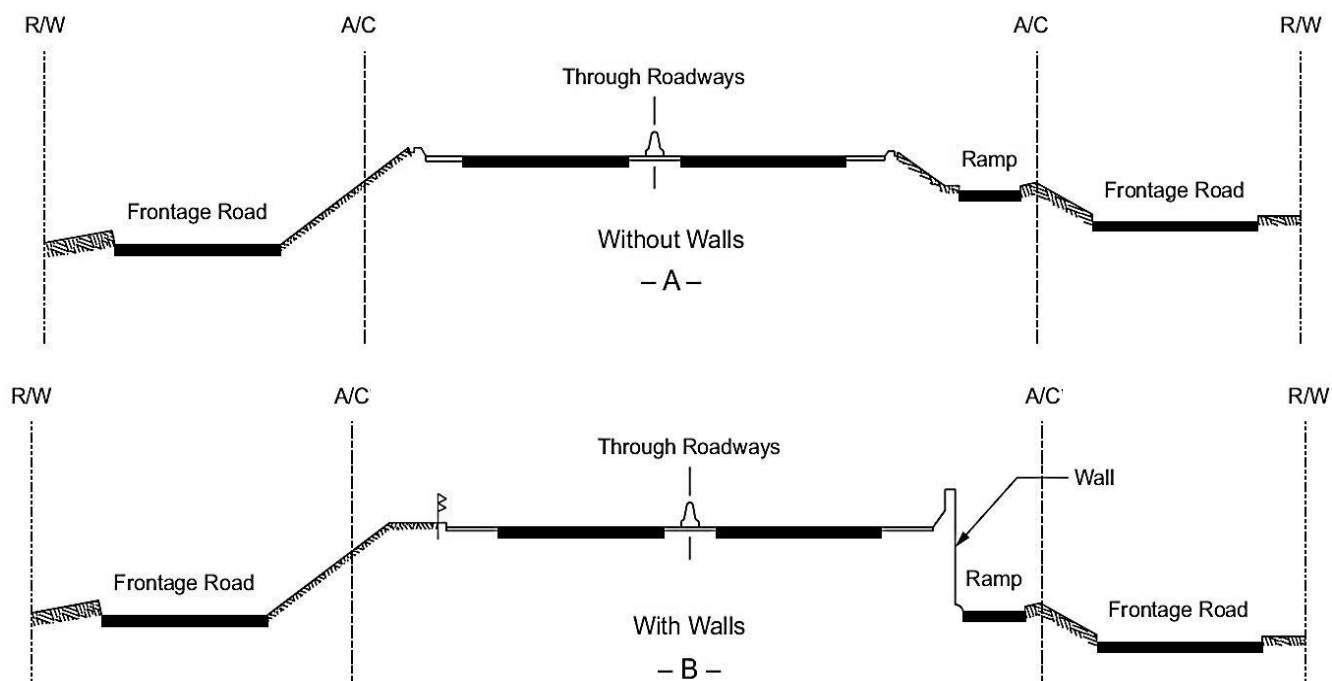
/6: Typical and Restricted Cross Sections for Elevated Freeways on Embankment [1, p.8-20]
